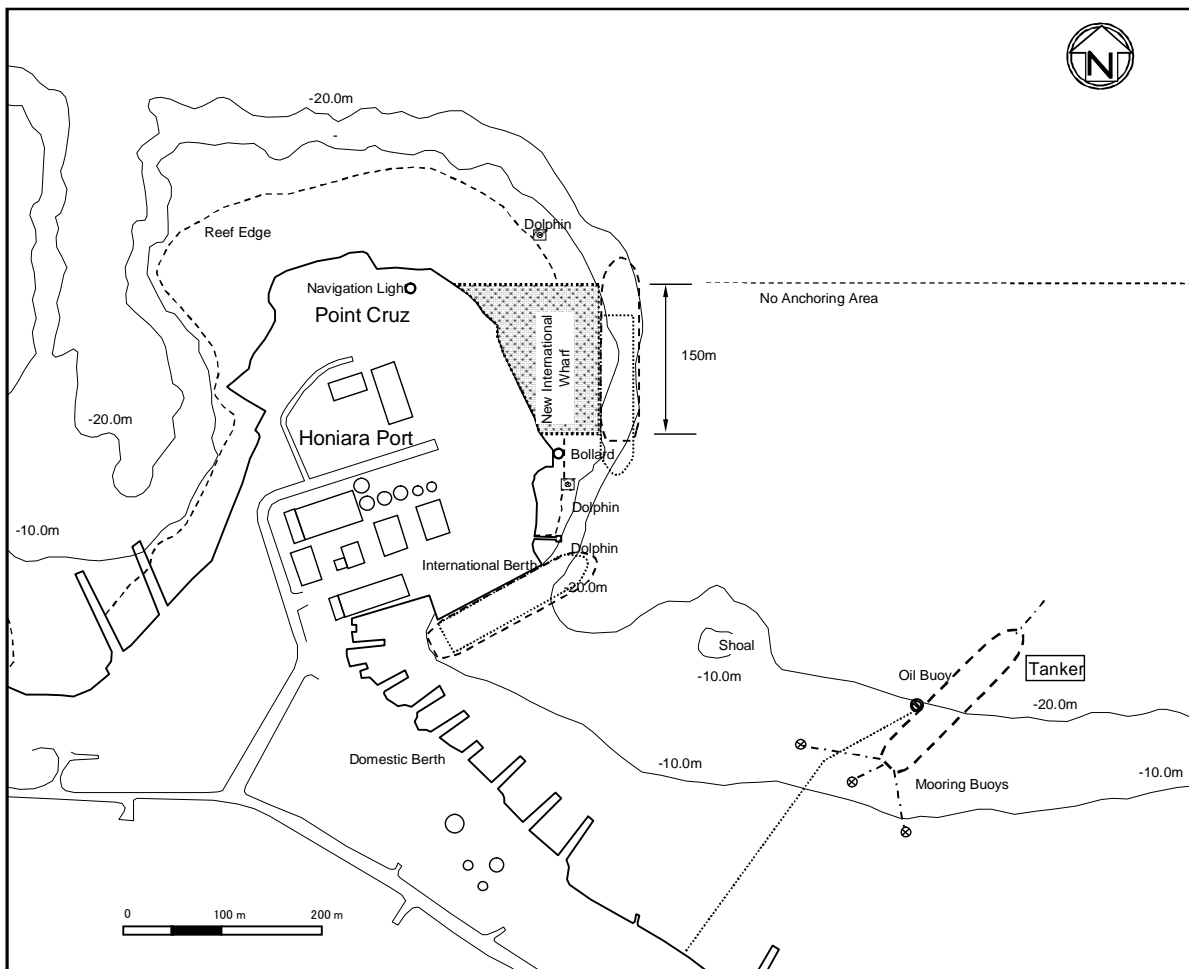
9 Layout Plan of New International Wharf in Honiara Port
